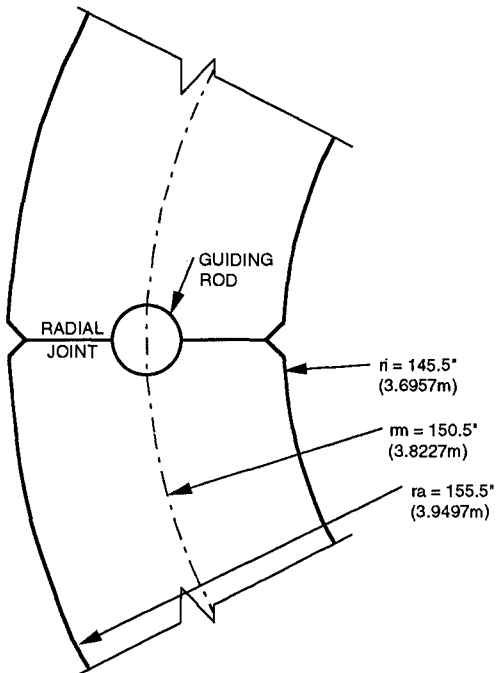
PRECAST TUNNEL LINER JOINT DETAIL
